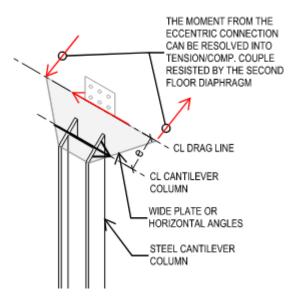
Offset cantilever column with wide plate used to resolve the tension-compression couple into the diaphragm.
